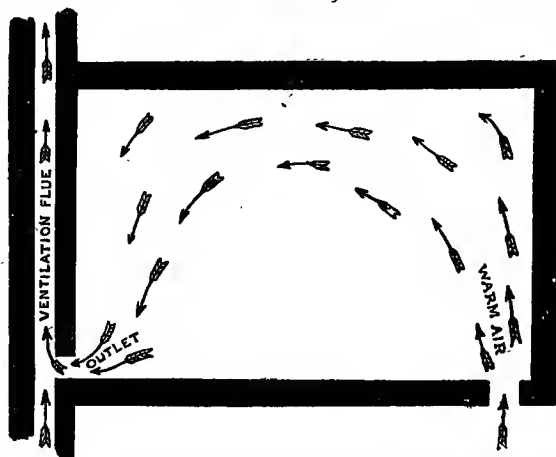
Gravity system, with inlet and outlet on opposite sides and near the floor
